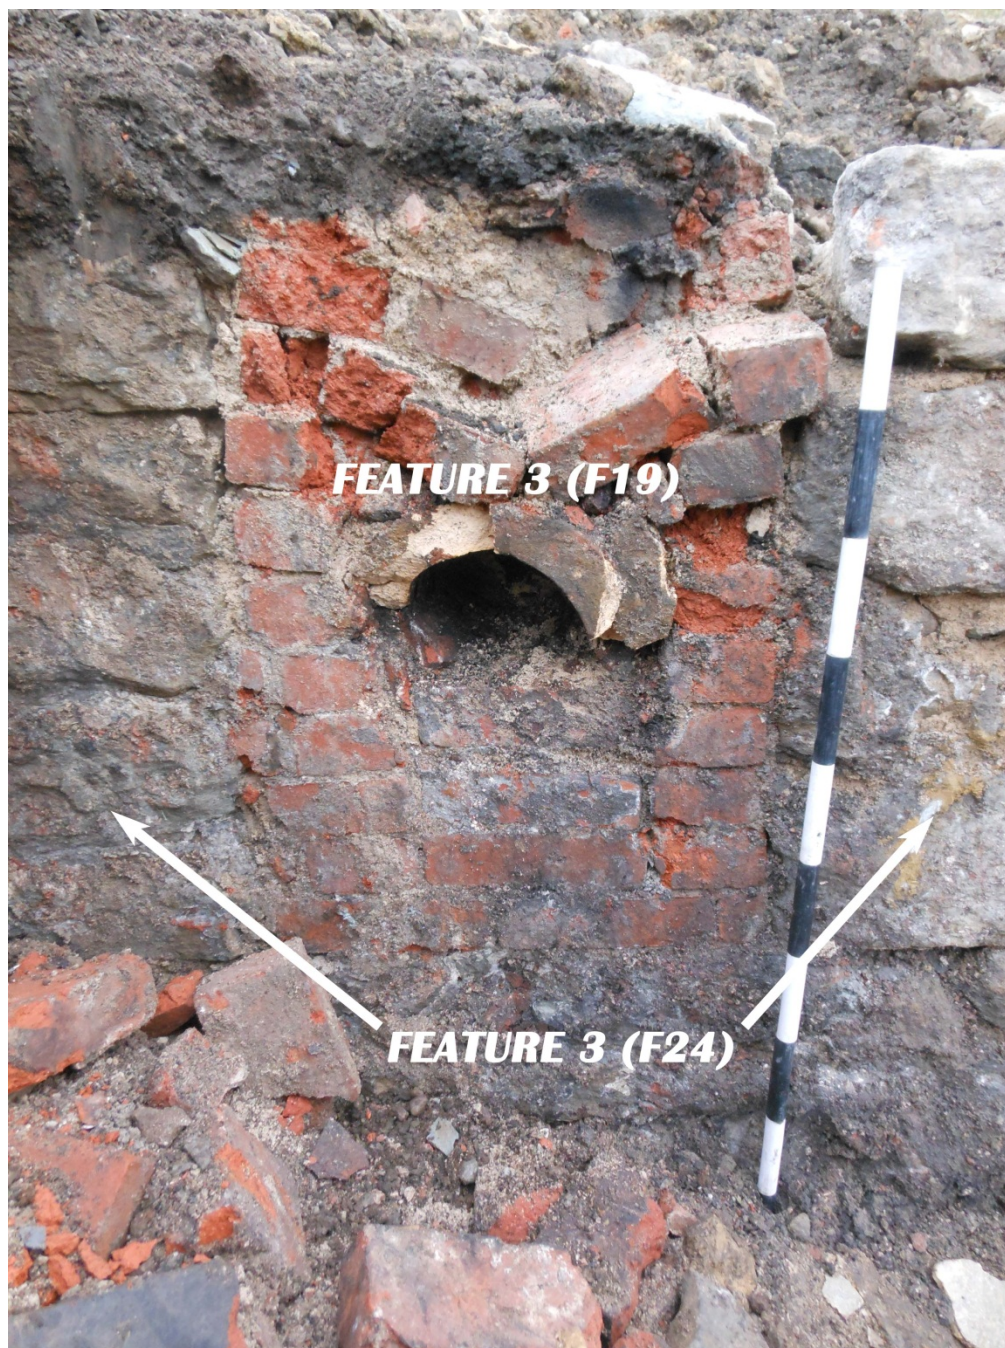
Photograph showing one of the chimneys (F19) in the east foundation wall of 29 Fulton Street.
